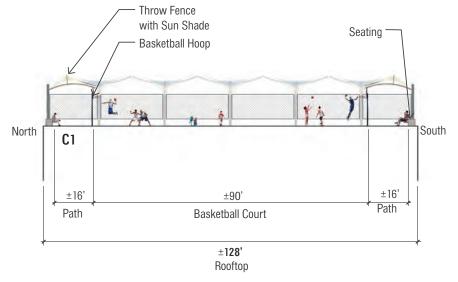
Illustrative Section A–A: Active Recreation Note: All dimensions and elevations are illustrative only.
